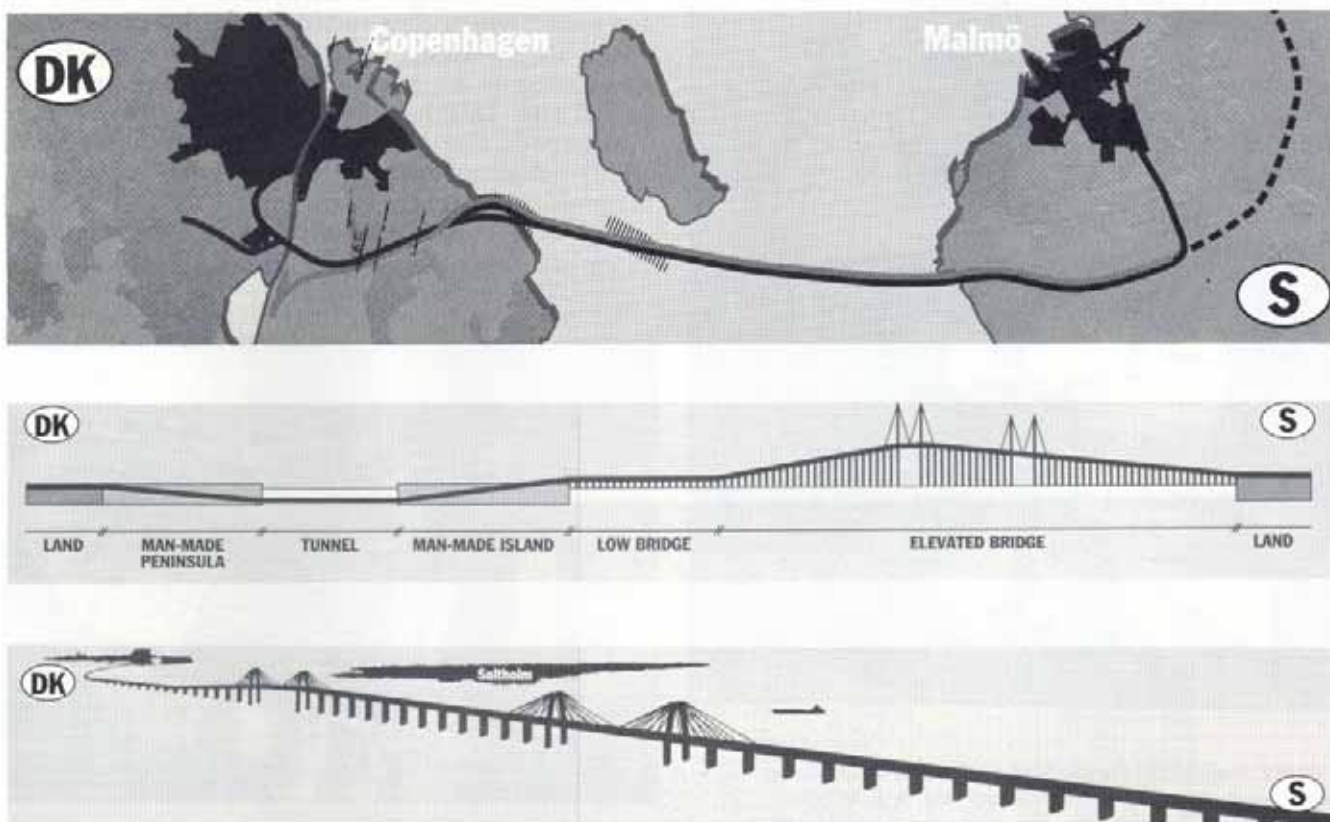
Plan, section and perspective views of the Oresund bridge and tunnel link.
